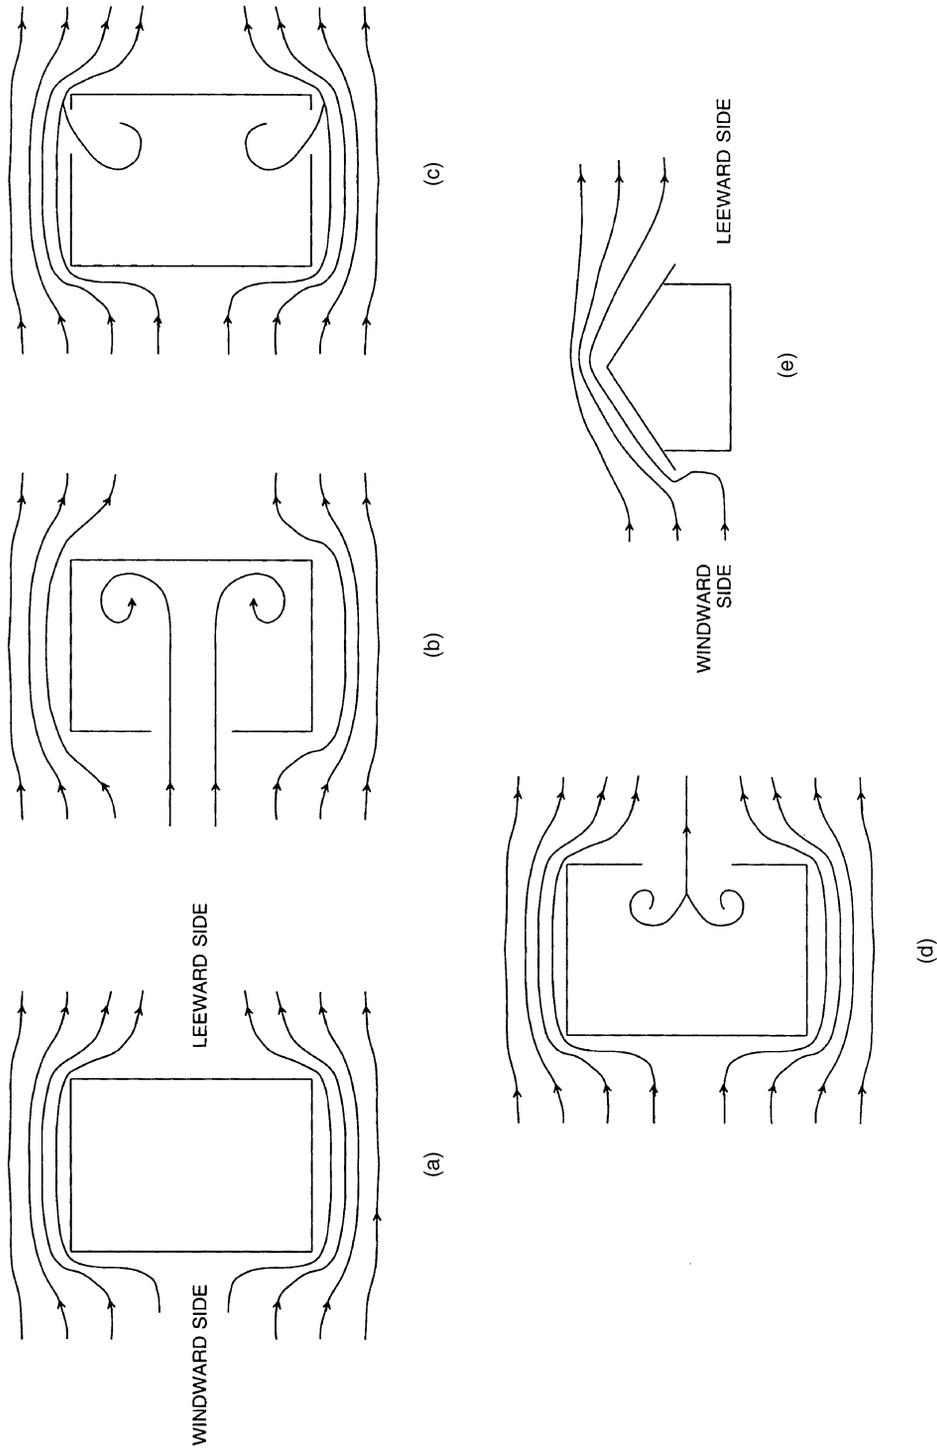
Plan view of a building indicating the wind loading on it with changes in velocity and direction of wind. (a) High pressure on the windward side but outward or reduced inward pressure on the leeward side. (b) Wind entering through an opening in the windward wall induces outward pressure on the interior of the walls. (c). (d) Wind entering through openings in a side wall or a leeward wall produce internal pressures in the building. (e) On a sloping roof, high inward pressure develops on the windward side, outward or reduced inward pressure on the leeward side.
